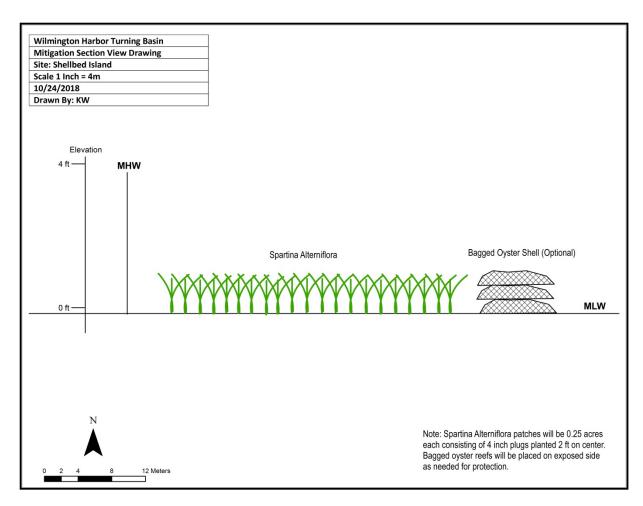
Conceptual Cross-sectional View of Proposed Wetland Planting Site
